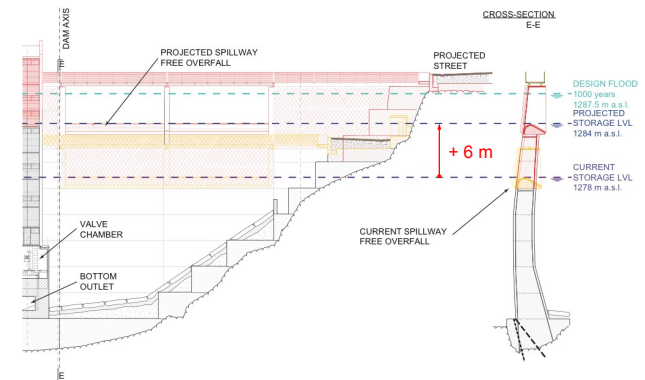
Downstream view of the proposed dam heightening (left) and cross-section (right) (drawings modified from Lombardi SA)
